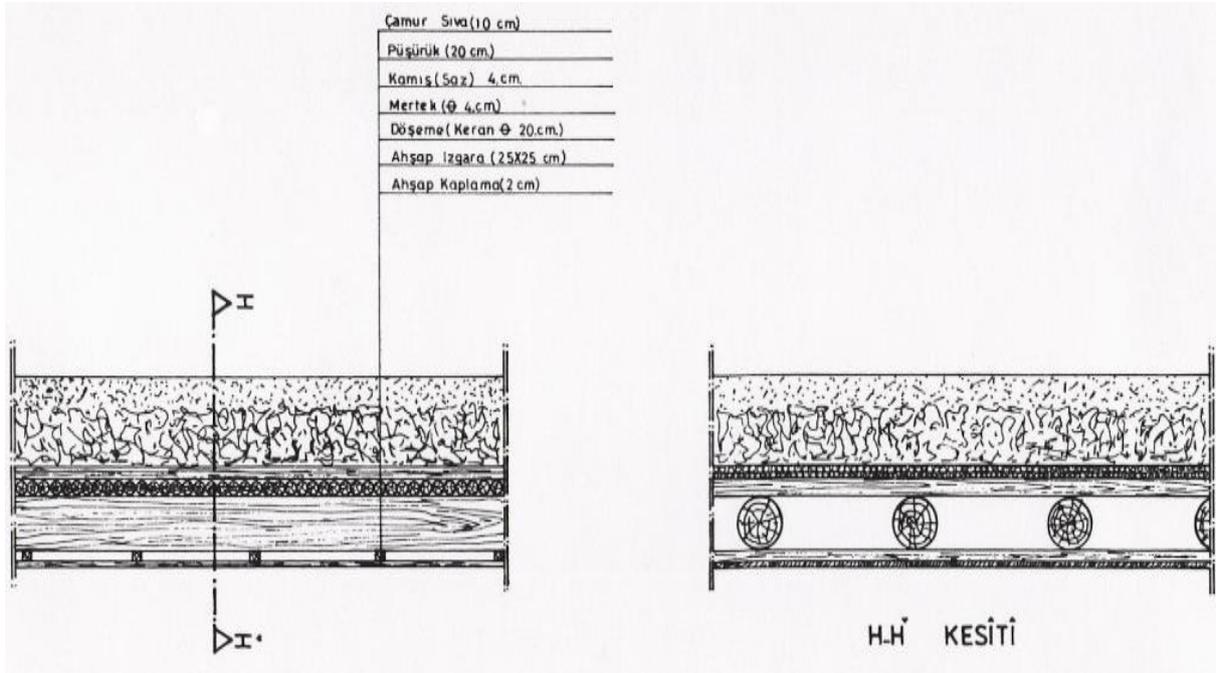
Soil roof covering on old Van house detail drawing [4].
